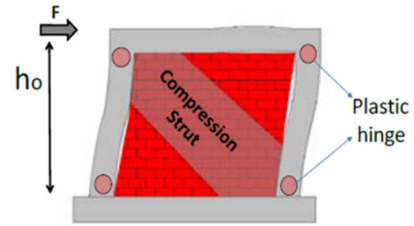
Failure Mechanism considered due to presence of masonry infill.
